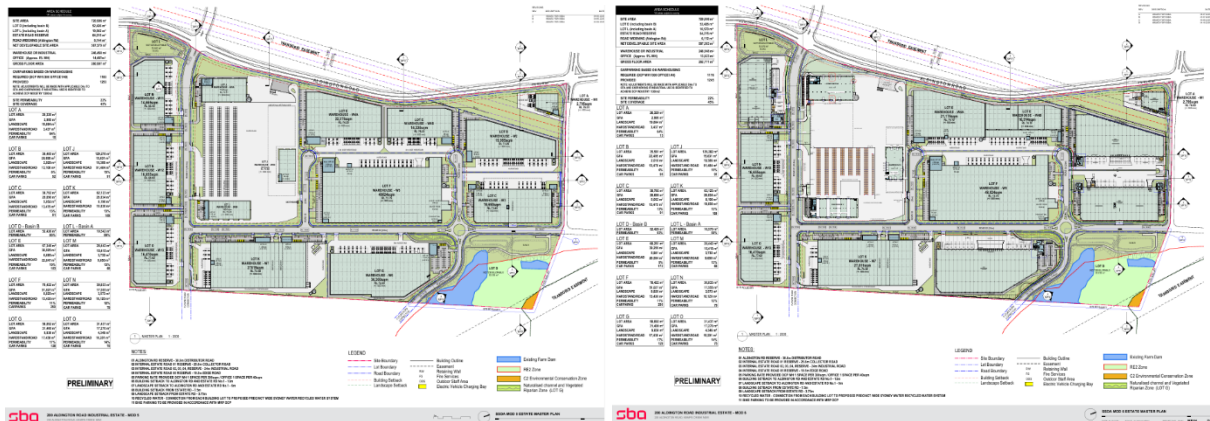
Overview of Concept Master Plan Latest Approved MOD 5 and proposed MOD 6
